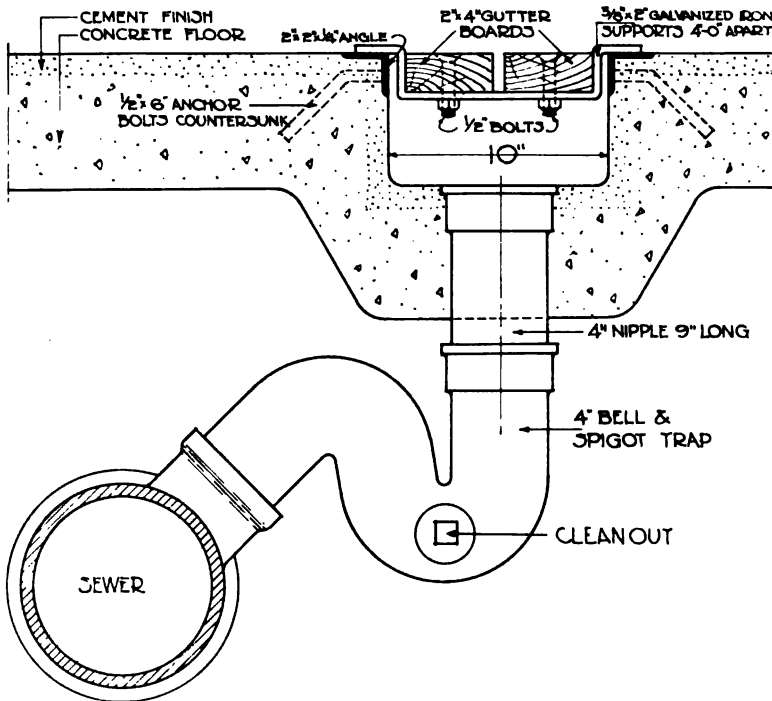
DETAIL OF GUTTER IN CELLAR FLOOR.
